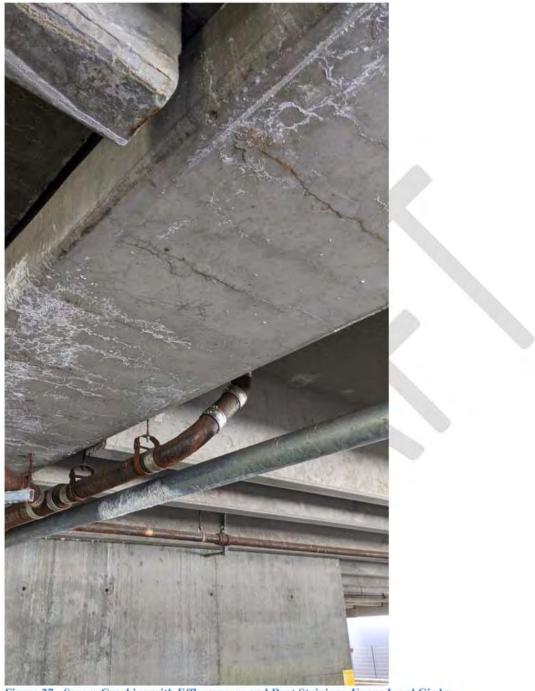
Severe Cracking with Efflorescence and Rust Staining - Upper Level Girder
